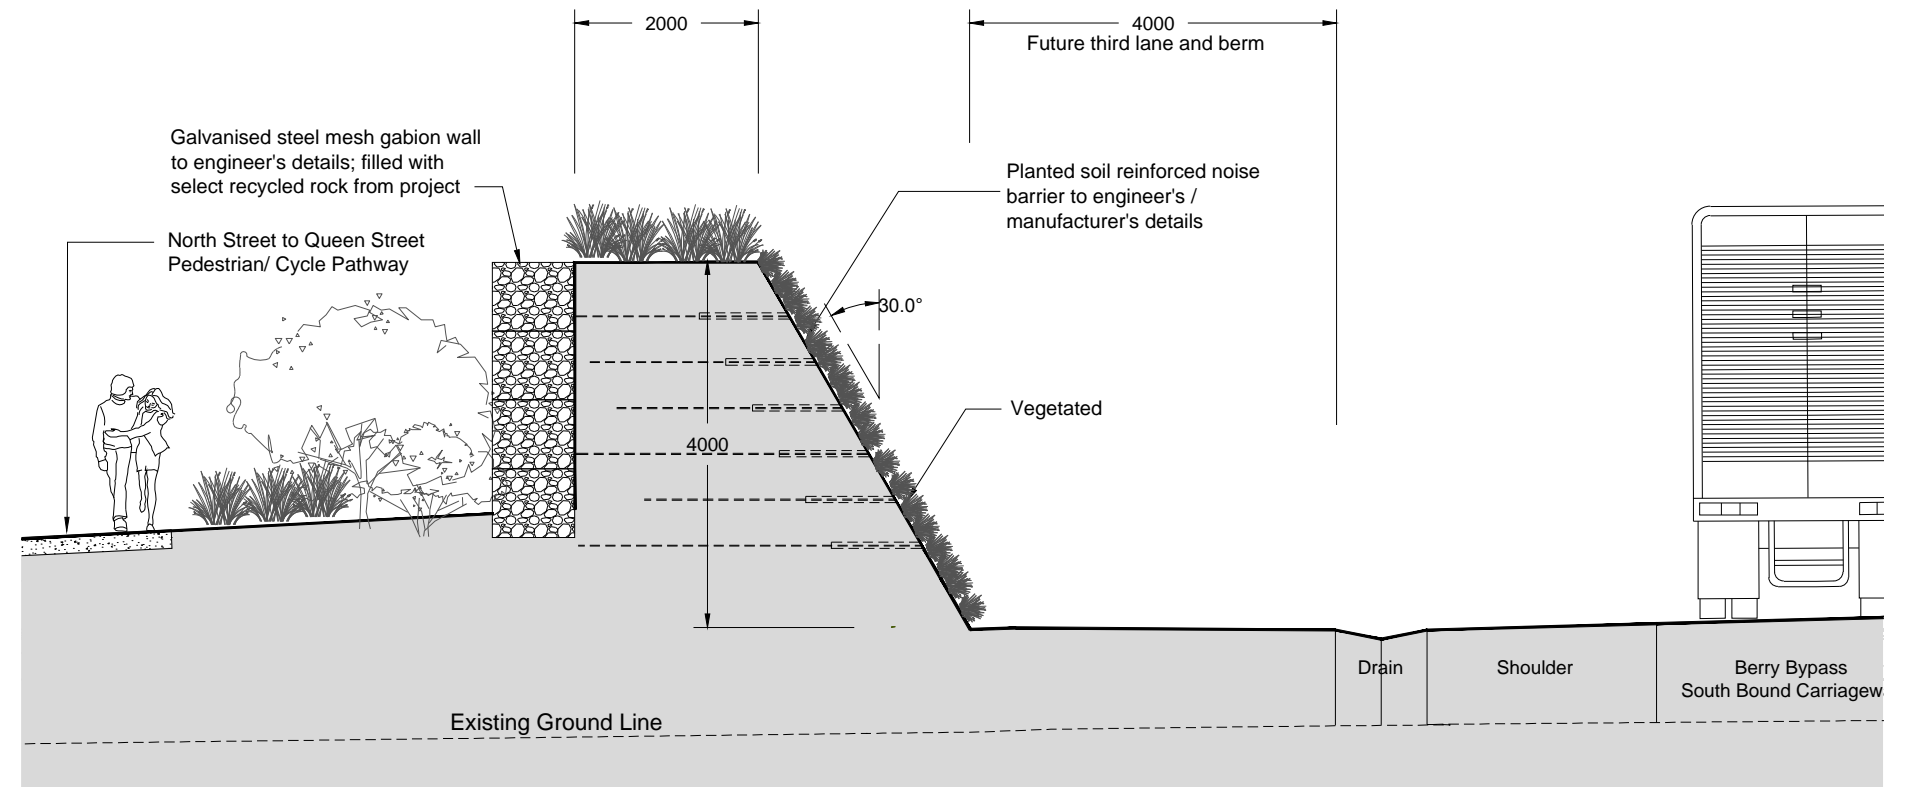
Noise barrier - planted soil reinforced typical cross section.
